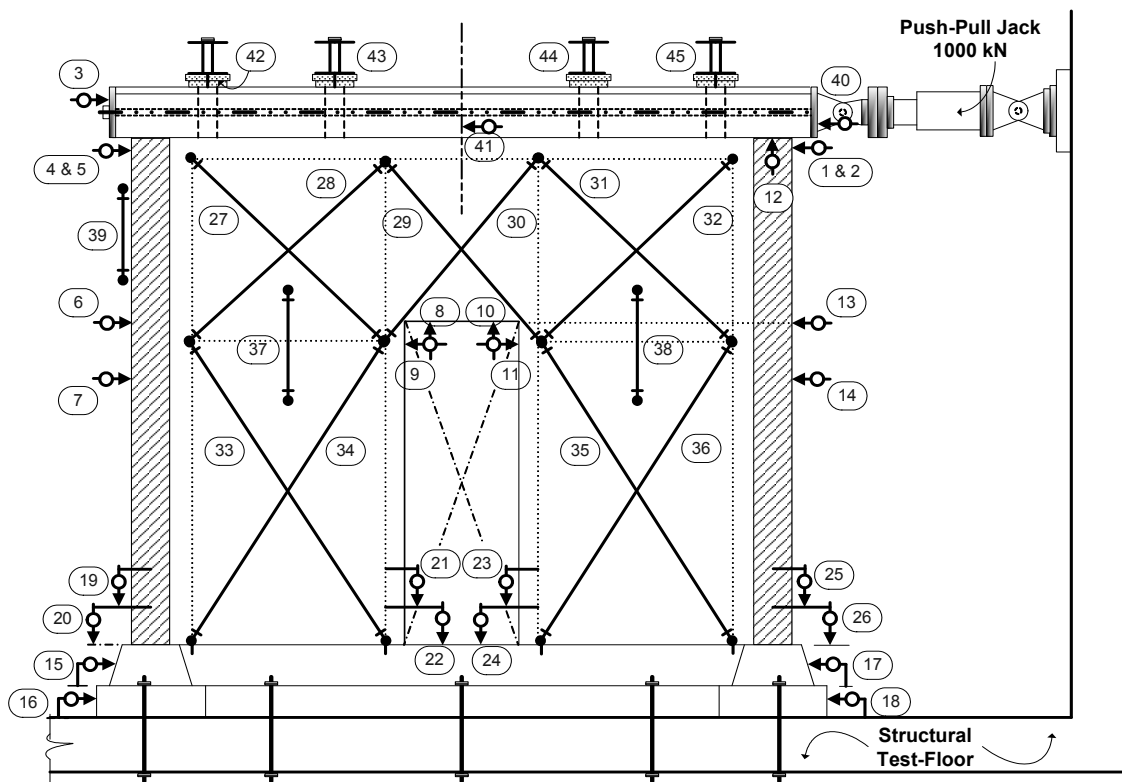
Position of displacement transducers (LVDTs) at URM Wall Unit-1
